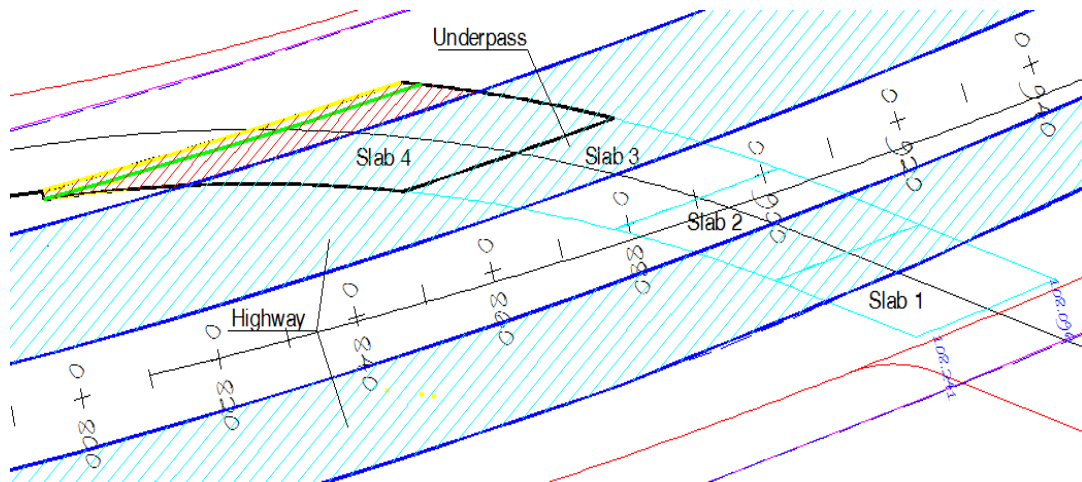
Details showing Al-Awali Bridge and the Road 4 highway.
